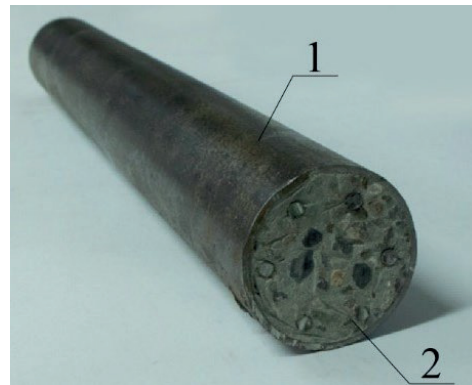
General view of steel tube confined concrete: 1 - outer shell (steel tube); 2 - inner filler (concrete)
